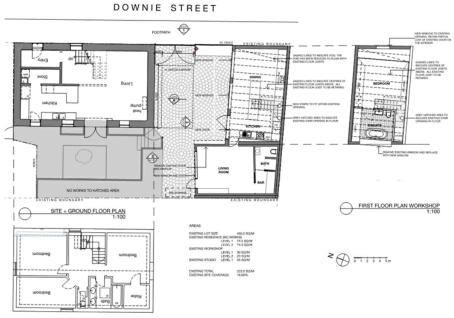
Proposed Floor Plan for Bakery and Workshop (Cumulus Studio, 2022)
